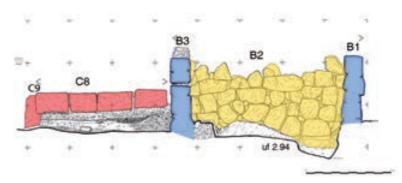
West elevation of the middle interior walls of House B/C with wall sections C8-B2 (Section L16 = *Pl. 11*). Drawing by B. Blomé, A. Bizzarro and G. Tilia.
